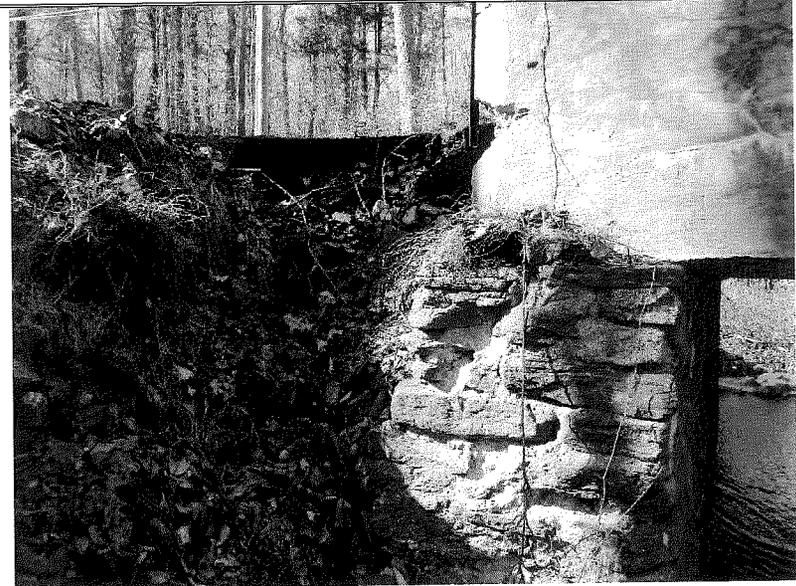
Southwest structure corner approach roadway missing approximately 4' long x 2' wide section of road edge.
